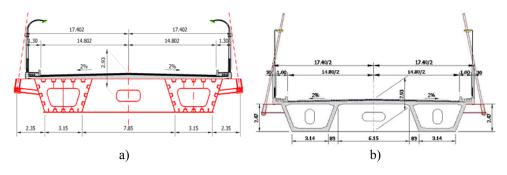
Cable-stayed bridge superstructure. Cross-section: *a)composite deck; b)pre-stressed concrete deck
